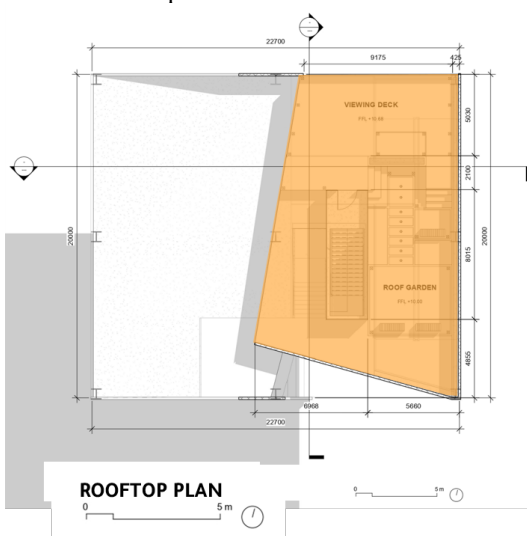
Rooftop plan of Tirtanadi Water Museum.
